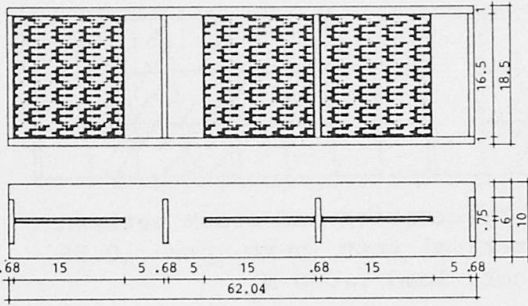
Geometrical characteristics of Hendry's specimen (inches).
